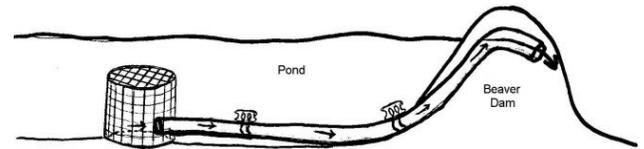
An example of a flexible pipe with a round fence used to control the water level at a dam.
